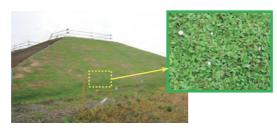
Slope planting: In this trial construction, clay discharged from screening process, was modified and then planting soil was made. All planting soil was recycled into planting construction works of the large-scale artificial ground that is created in Natori city, Miyagi Prefecture.
